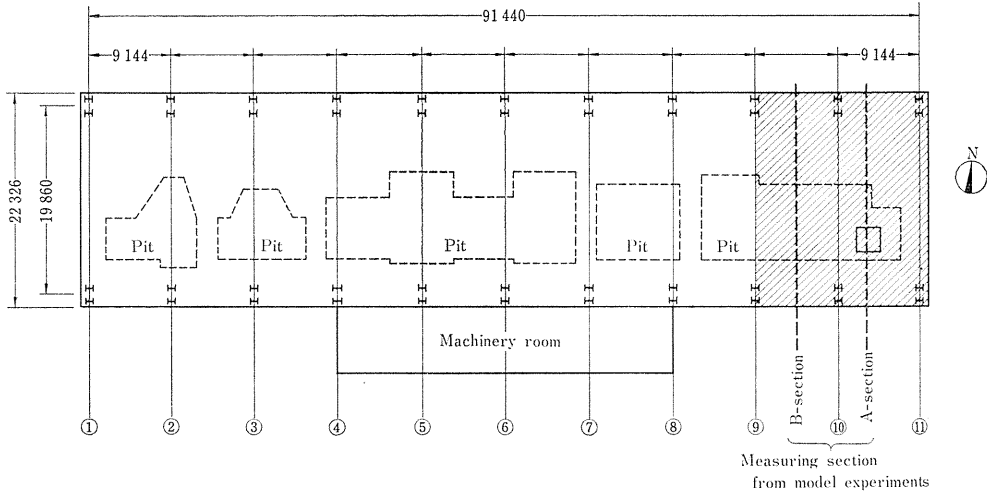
Plan of M-Factory manufacturing large precise machines (mm).
